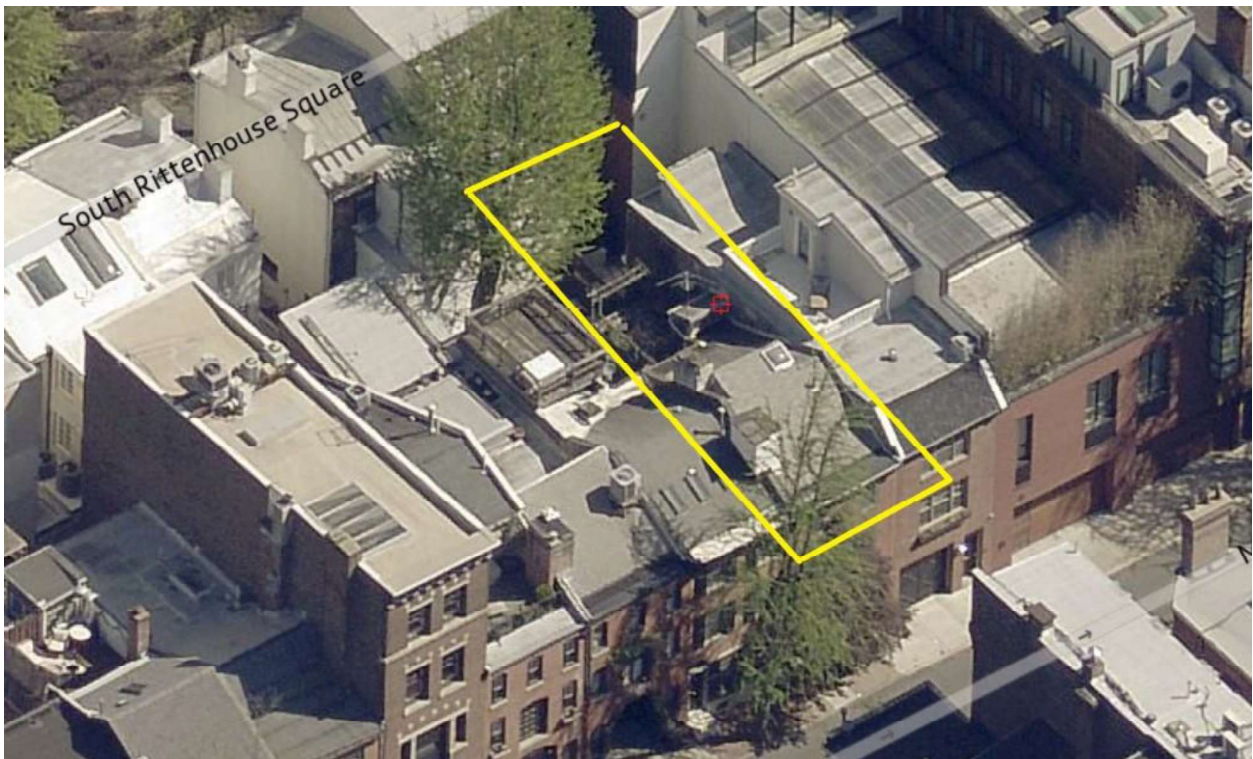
Aerial view looking northeast at 1923 Manning Street roof.
